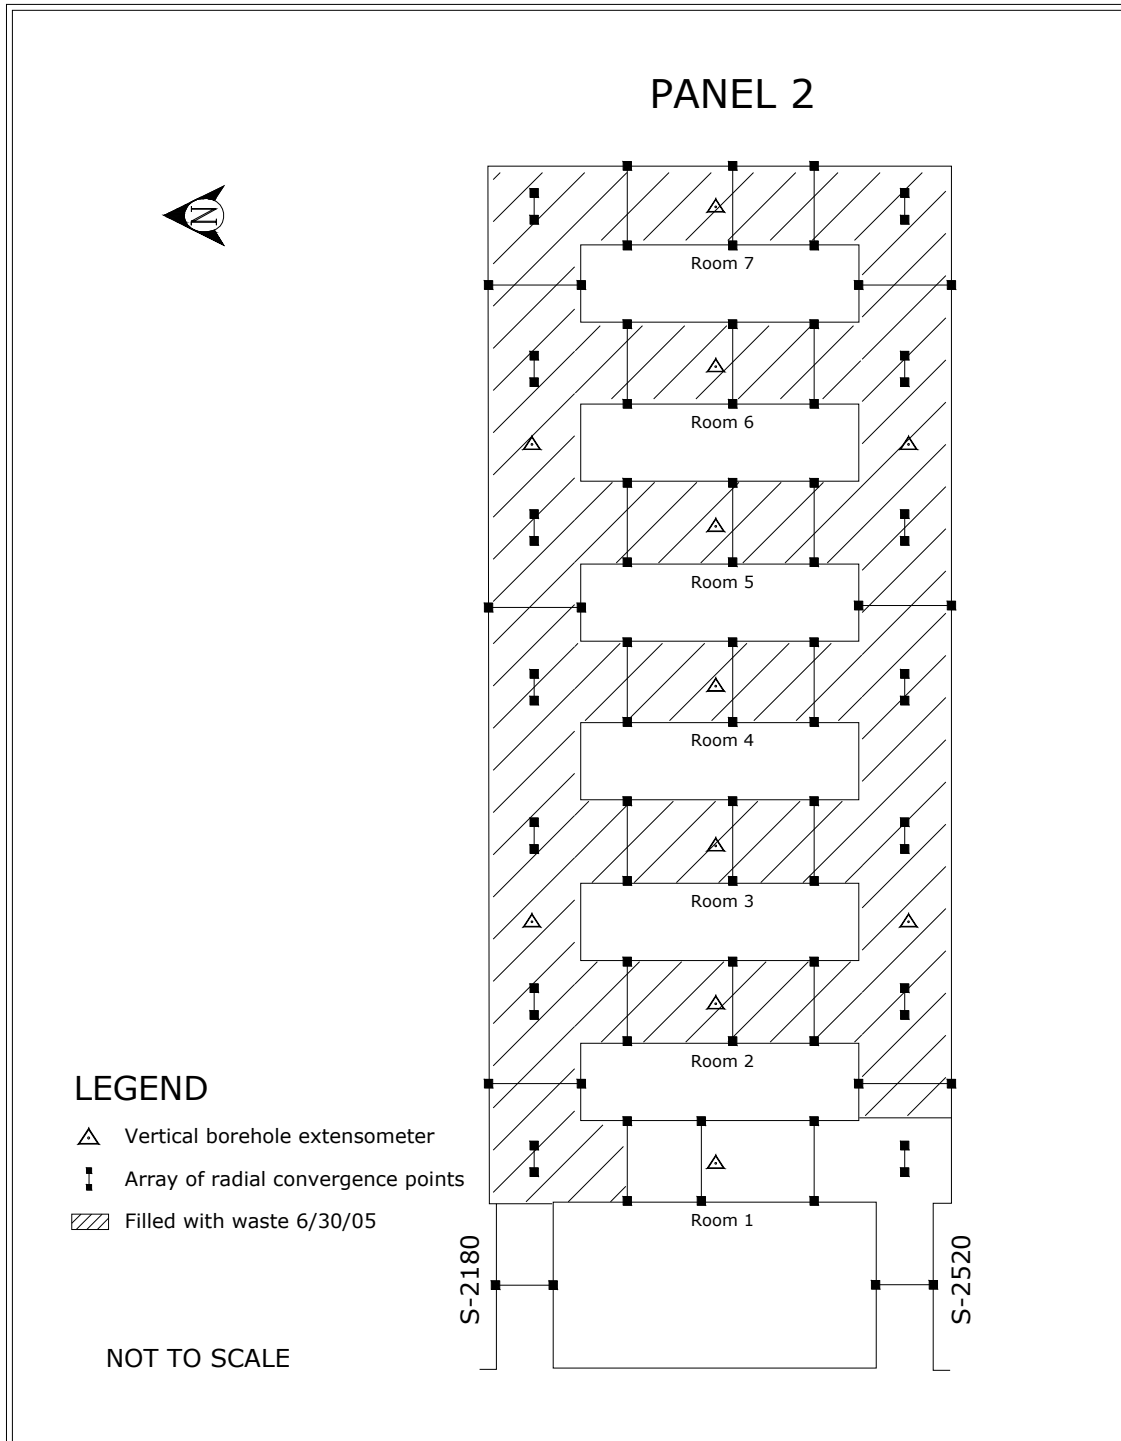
Location of Panel 2 Geotechnical Instruments
